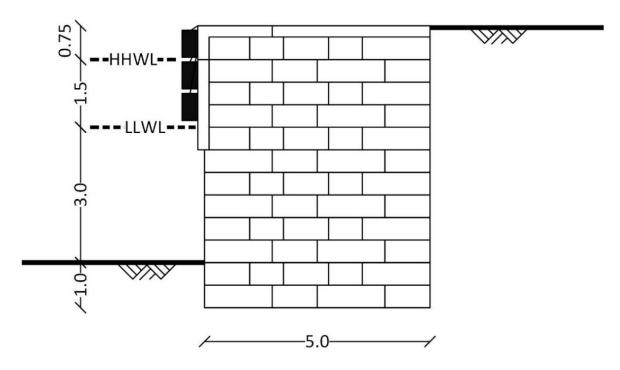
Quay wall design in more detail; showing the gabion structure, concrete slab and car tyres.
